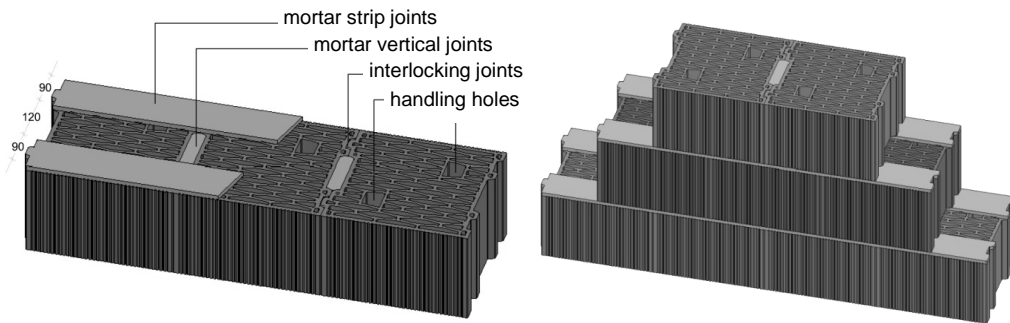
Masonry details schematics for clay masonry (dimensions in mm)
